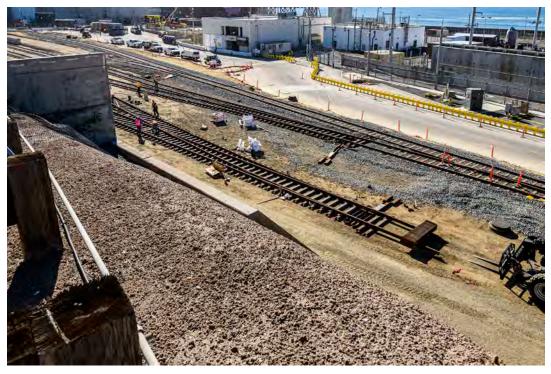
Expansion of On-site Rail Spur (Looking West) (2022)
